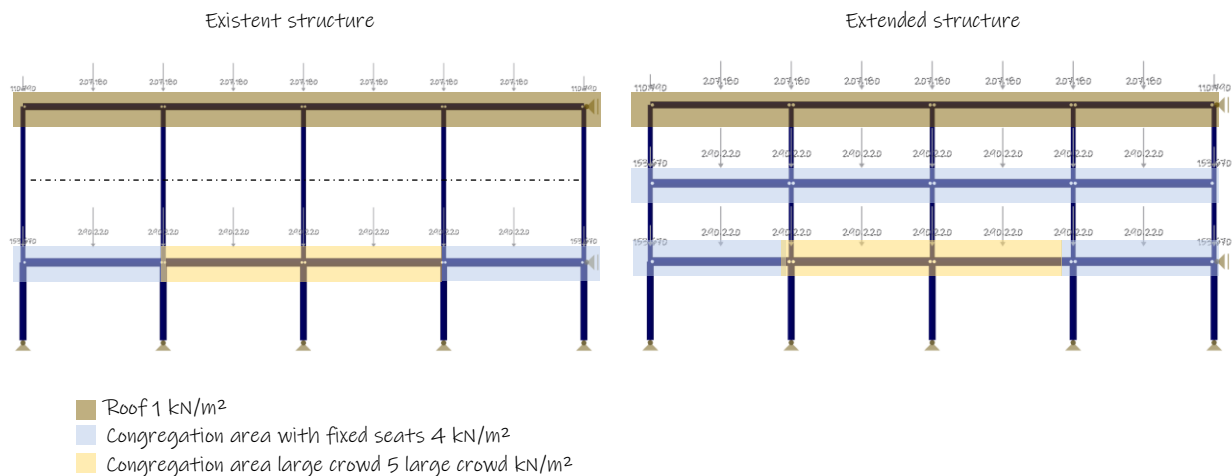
The existing demountable scalable design structure and original loads (left) contrasted with the extended structure and updated loads (right). A detailed legend for clarity (bottom).
